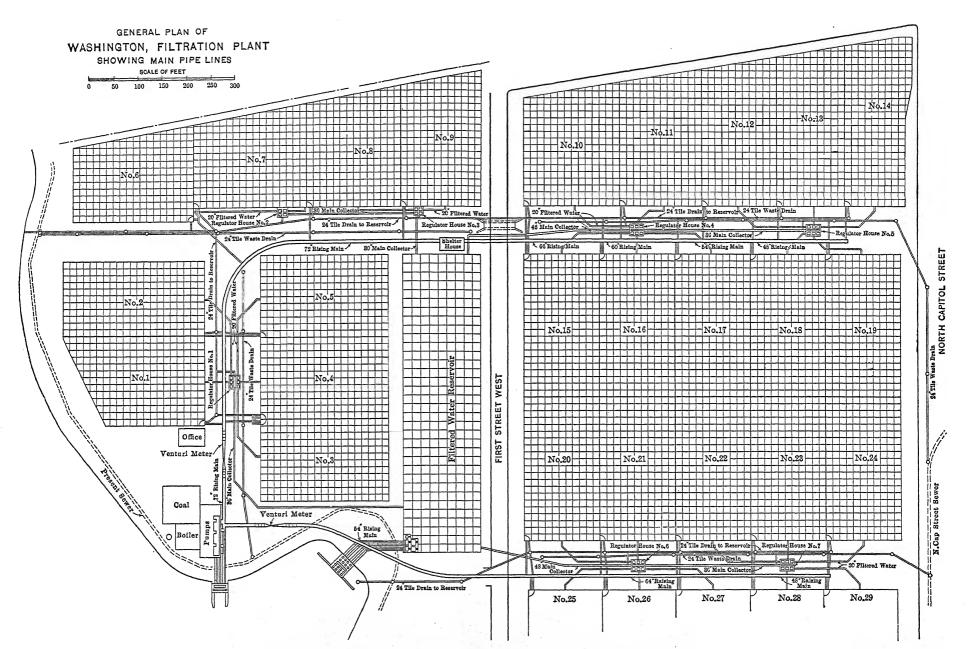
General plan of Washington filtration plant showing main pipe lines.
